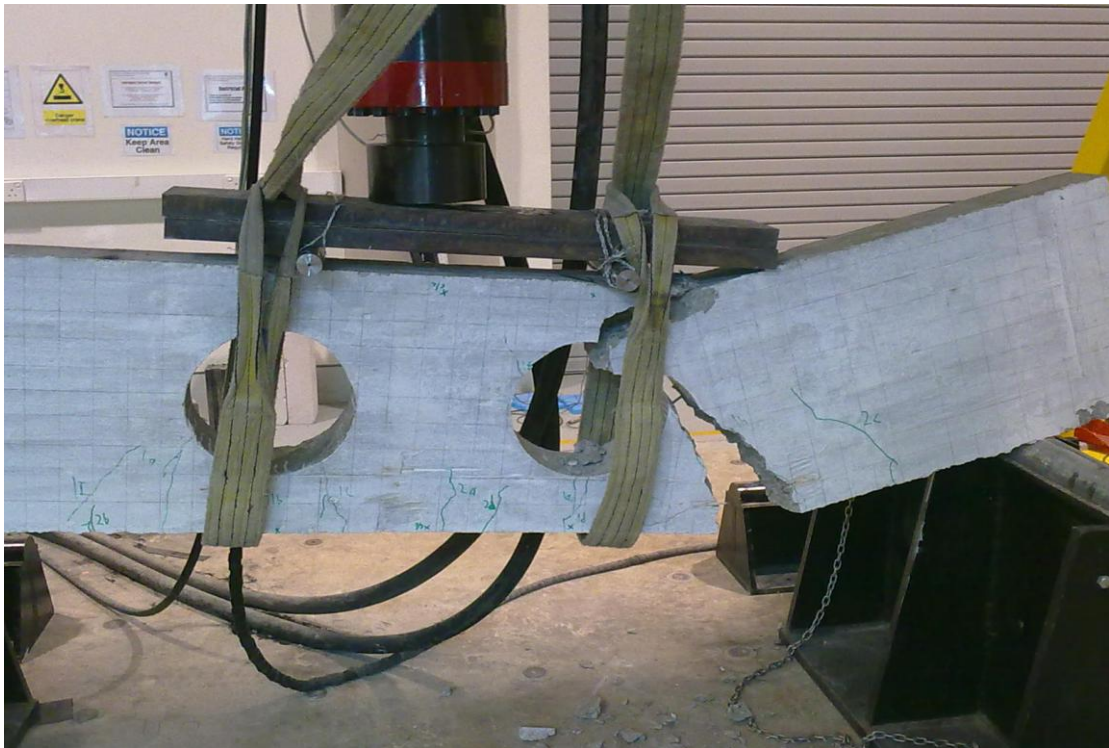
Failure Mode of Beam with Circular Opening with CFRP Sheets subjected to Cyclic Load
